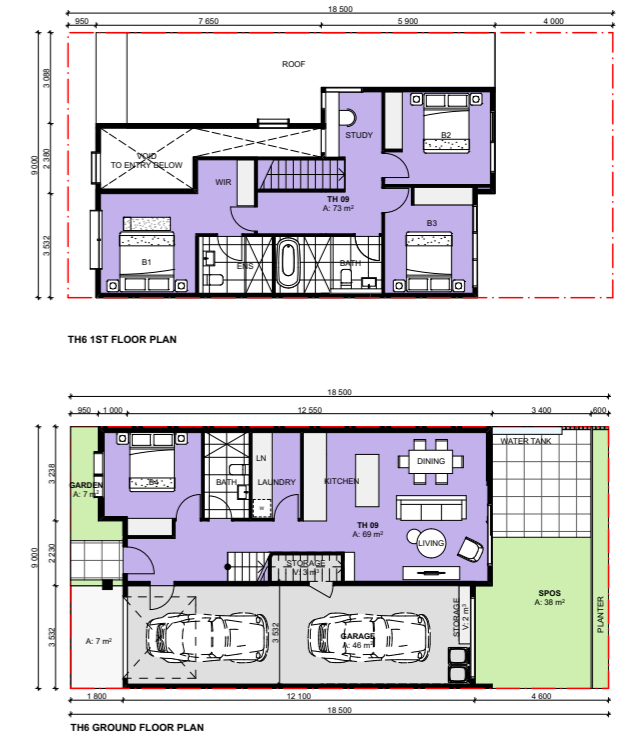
Townhouse Type 9 (Source: Plus Architecture)
